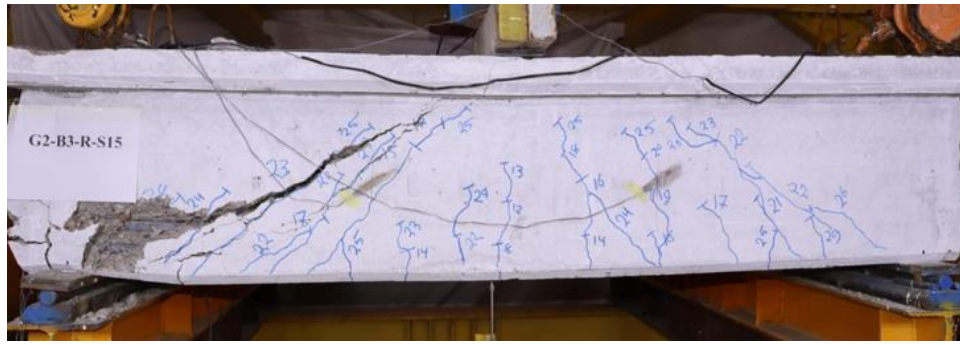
Failure crack pattern of specimen G2-B3-R-S15
